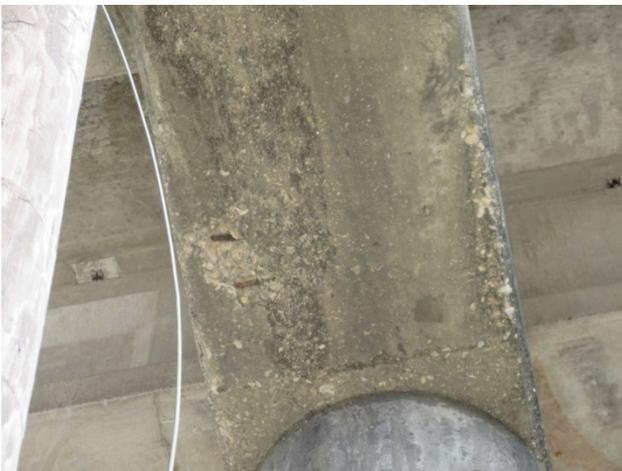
Spalling on Soffit of Bent Cap
